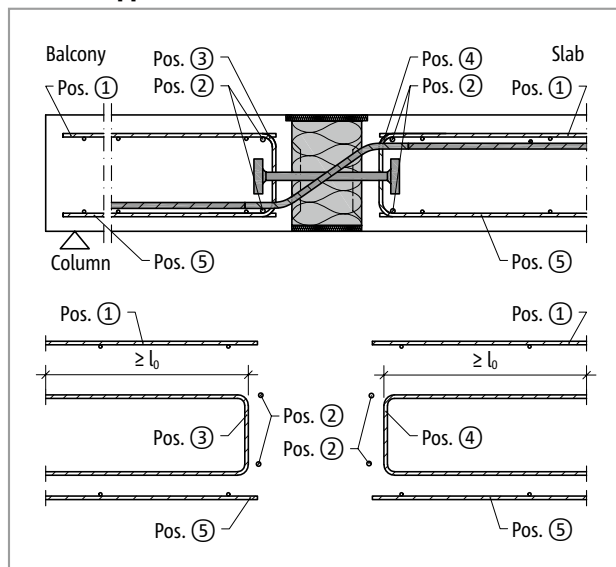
Schöck Isokorb® XT type Q-P: On-site reinforcement
